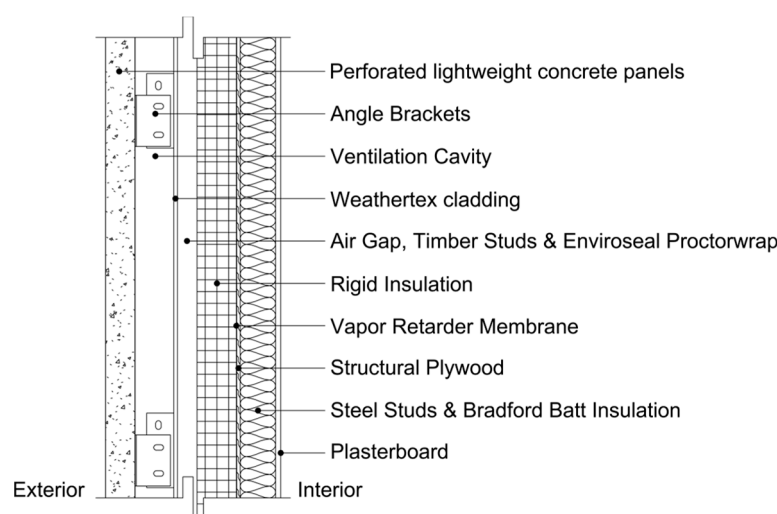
UOW's house: vertical section of the exterior wall. (By authors based on the team UOW's drawings).
